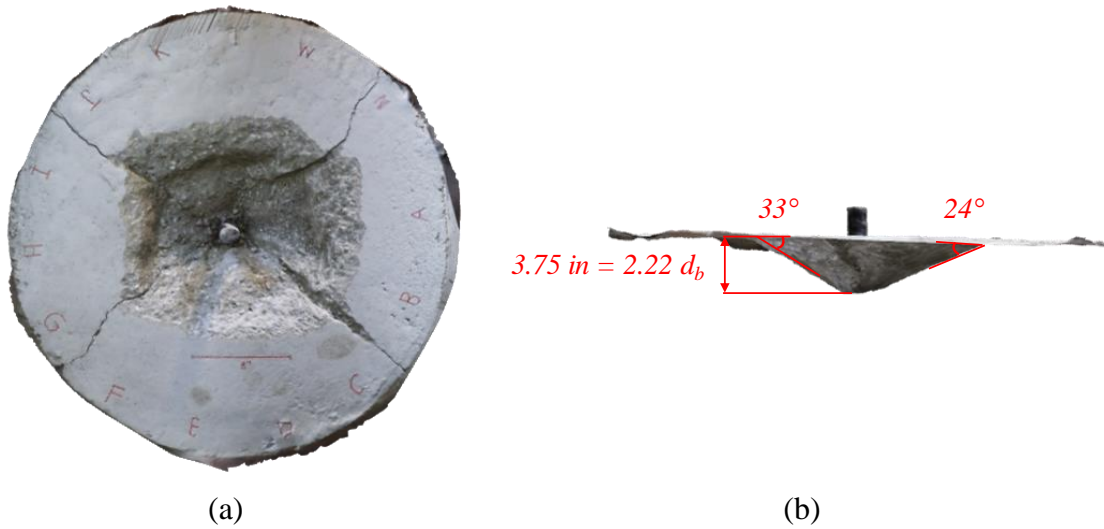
3D Point Cloud Model of Fracture Surface of Test Specimen #4: (a) Plan View; (b) Cone Shaped Fracture
